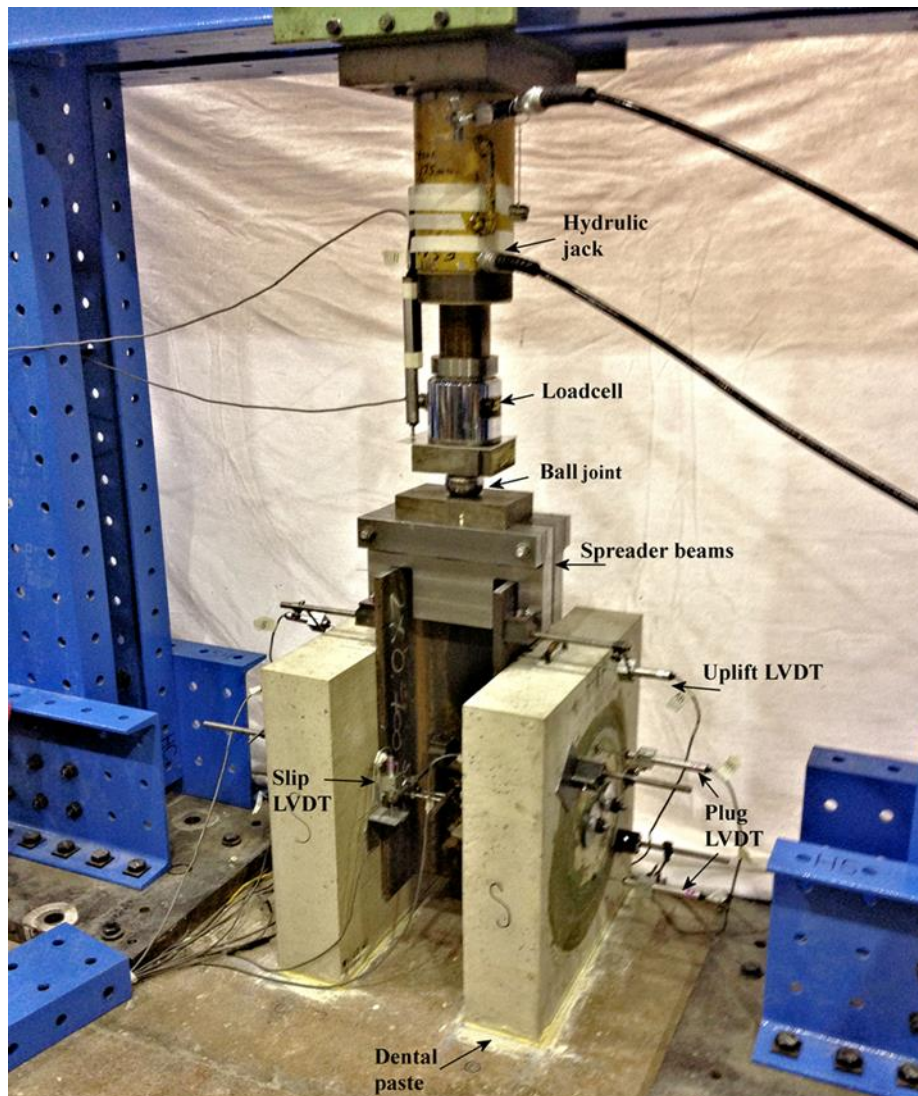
Details of testing rig and specimen for LNSC pushout tests 1
